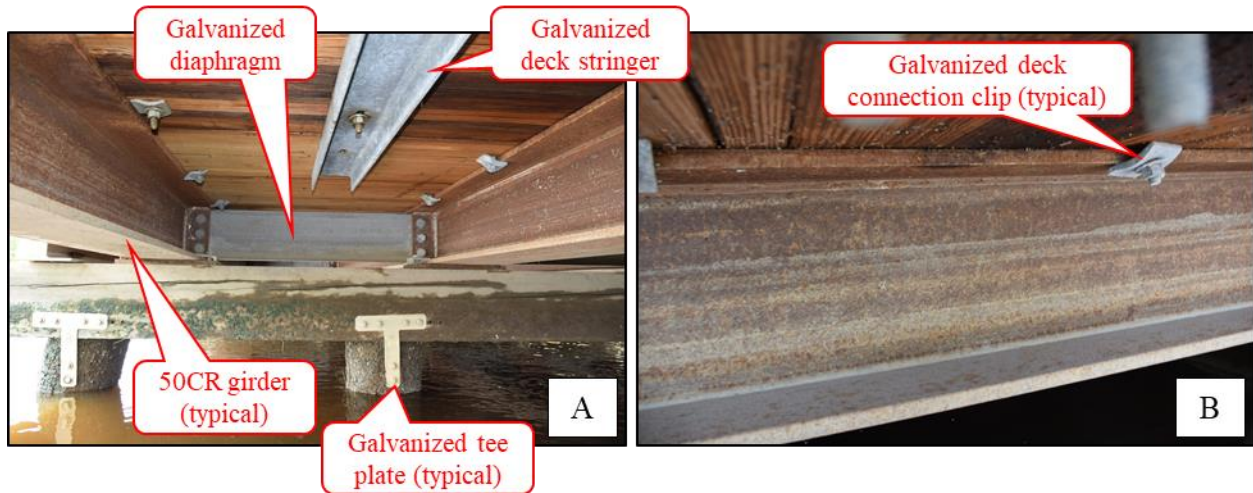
Photographs of Underneath Side of the 2022 Holdens Creek Bridge: (A) general view; (B) close-up of 50CR steel girder.
